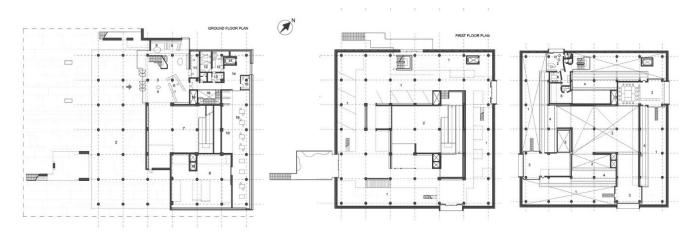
Floor Plans of National Museum of Western Art, Tokyo. (L) Ground floor plan, (C) First Floor Plan, (R) Second Floor Plan. Source: http://archeyes.com/national-museum-western-art-tokyo-le-corbusier
